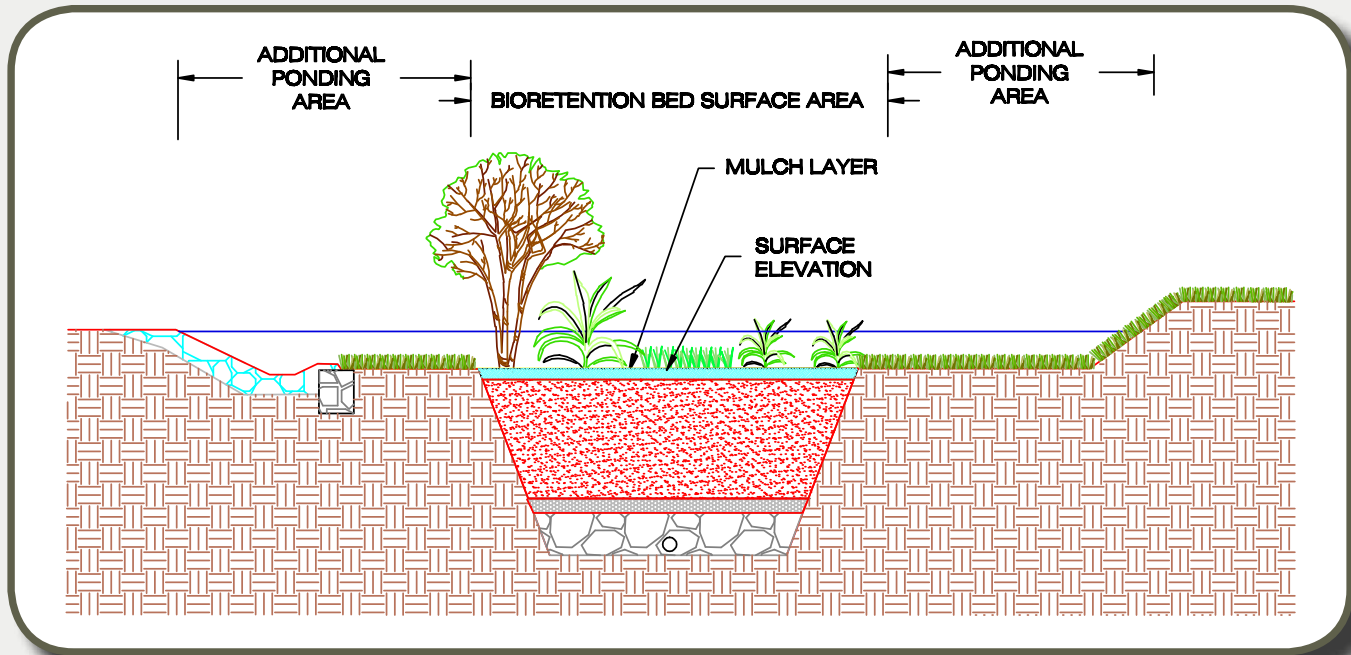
Typical section of Bioretention with additional surface ponding area
